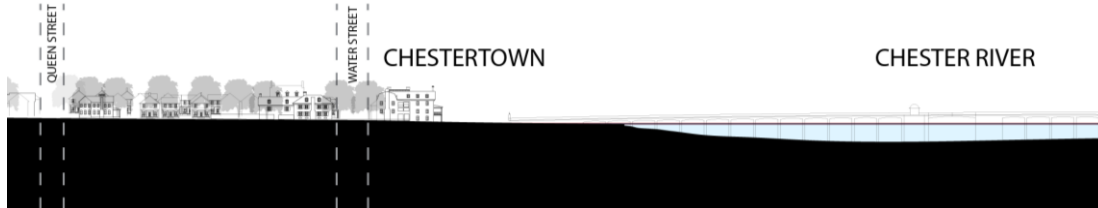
Site Plan of Chestertown - Sea Level Rise by 2050 (2 FT)
